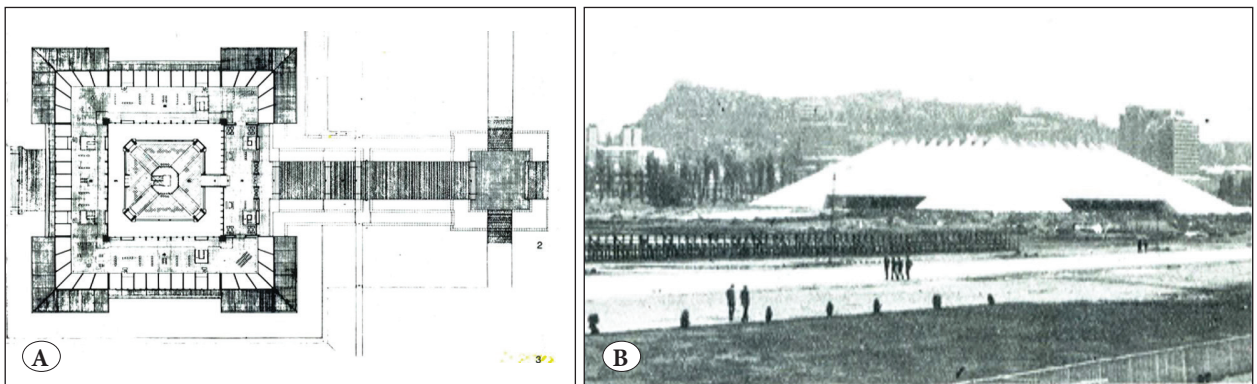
A and 2B. The ground floor plan and elevation of ACC in Ankara.
